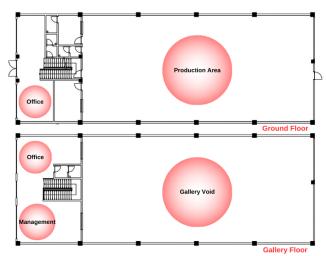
Project Area Ground and First Floor Plans. (Reference: Personal archive, 2022)
